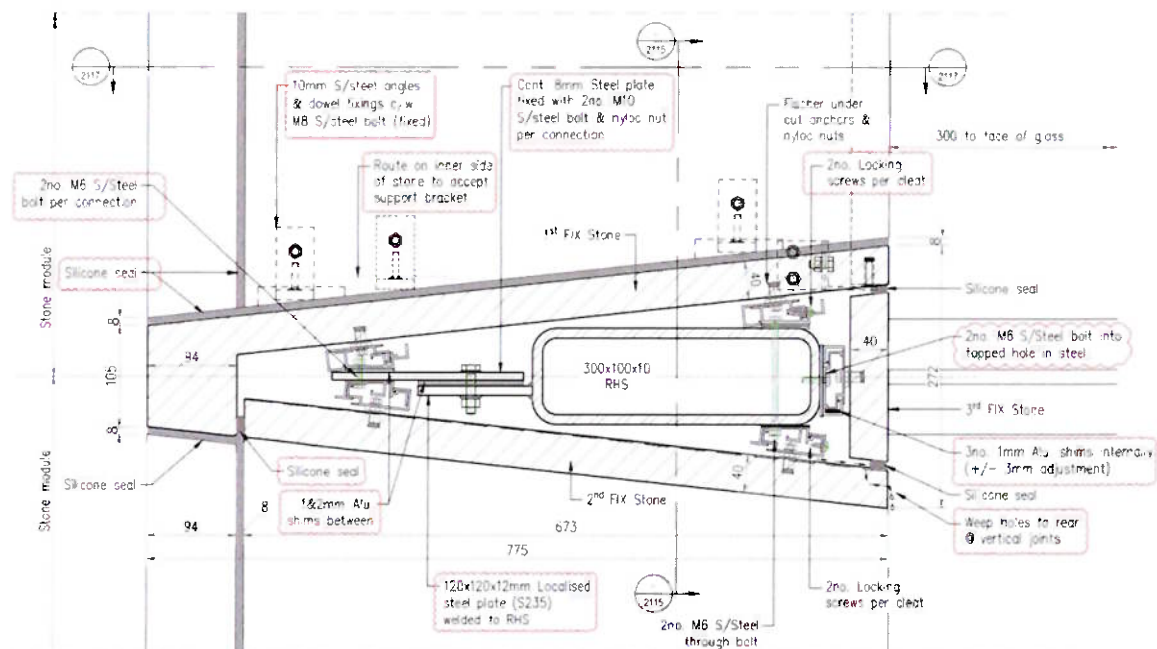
EWS-002 Vertical section of stone profiles with support structure (typical horizontal fin)
